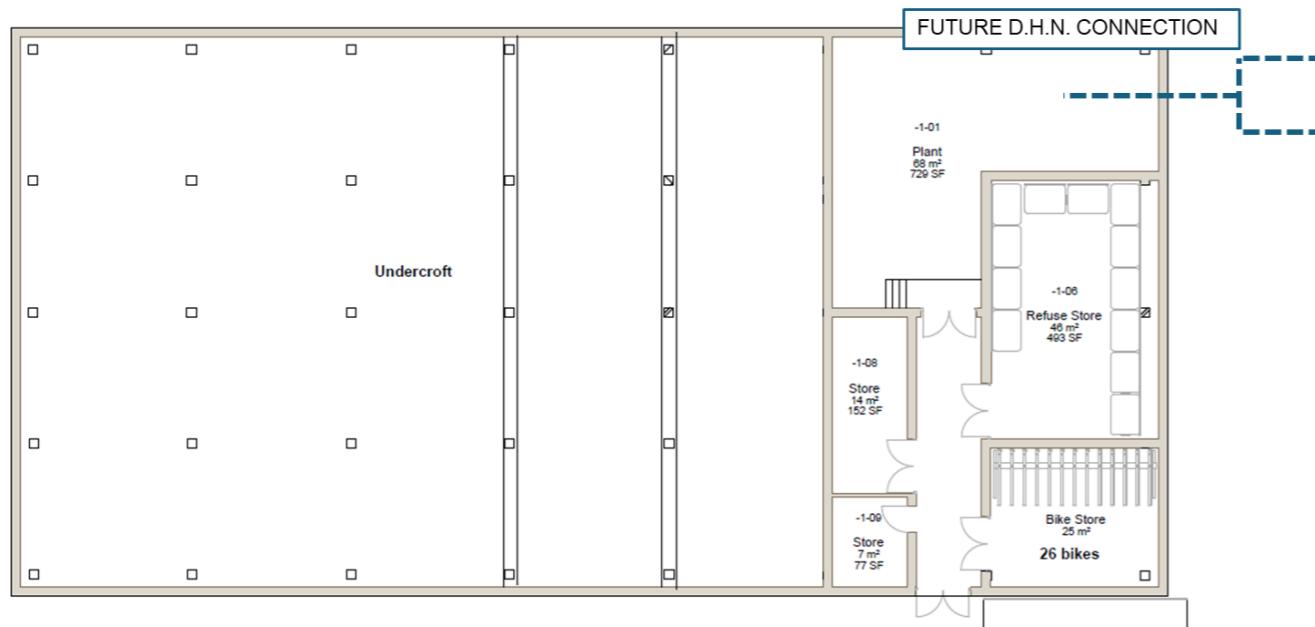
BASEMENT PLAN FOR PICASSO HOUSE ILLUSTRATING POTENTIAL DHN CONNECTION LOCATION
